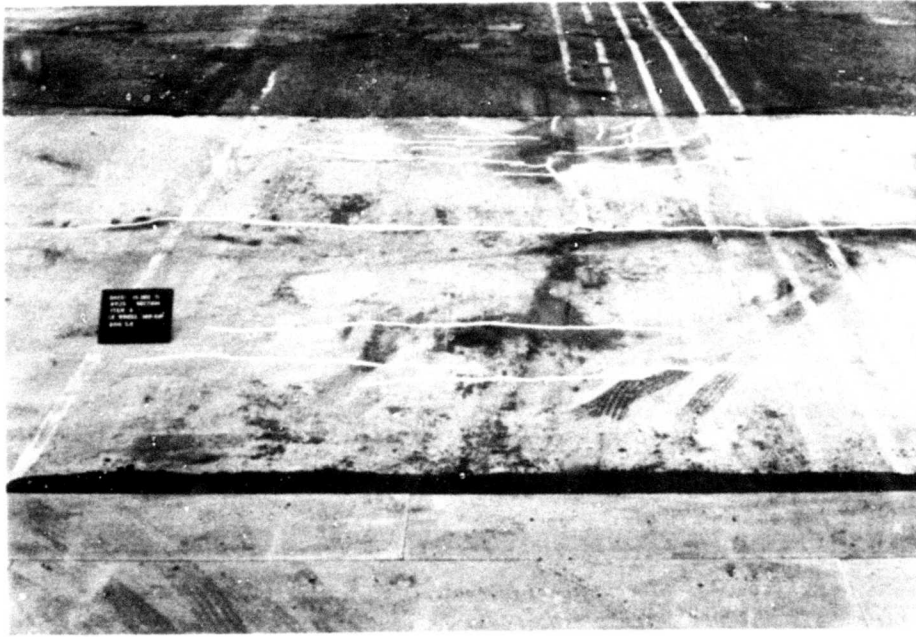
Condition of 6-in. Fibrous Concrete Test Item After 4400 Traffic Loadings
